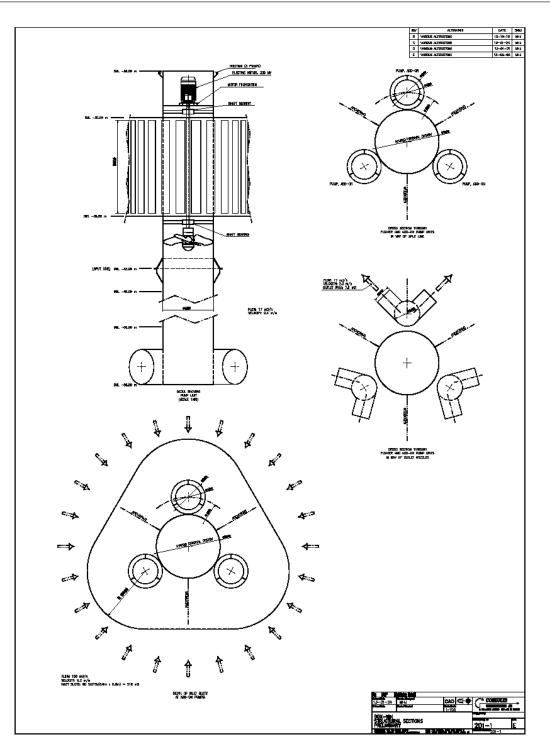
Conceptual design drawing, horizontal cross section views of the Demonstrator and its pump configuration, and vertical cross section view of a pump unit (top left image).
